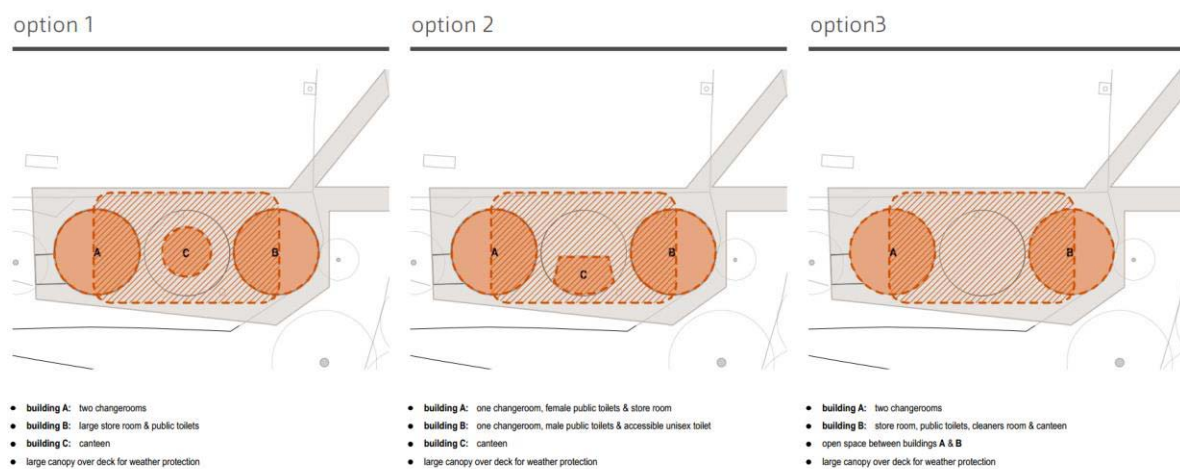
Floor plan options for new amenities over water tanks. Buildings shown in orange, canopy roof over dashed. Timber deck around perimeter in grey.
